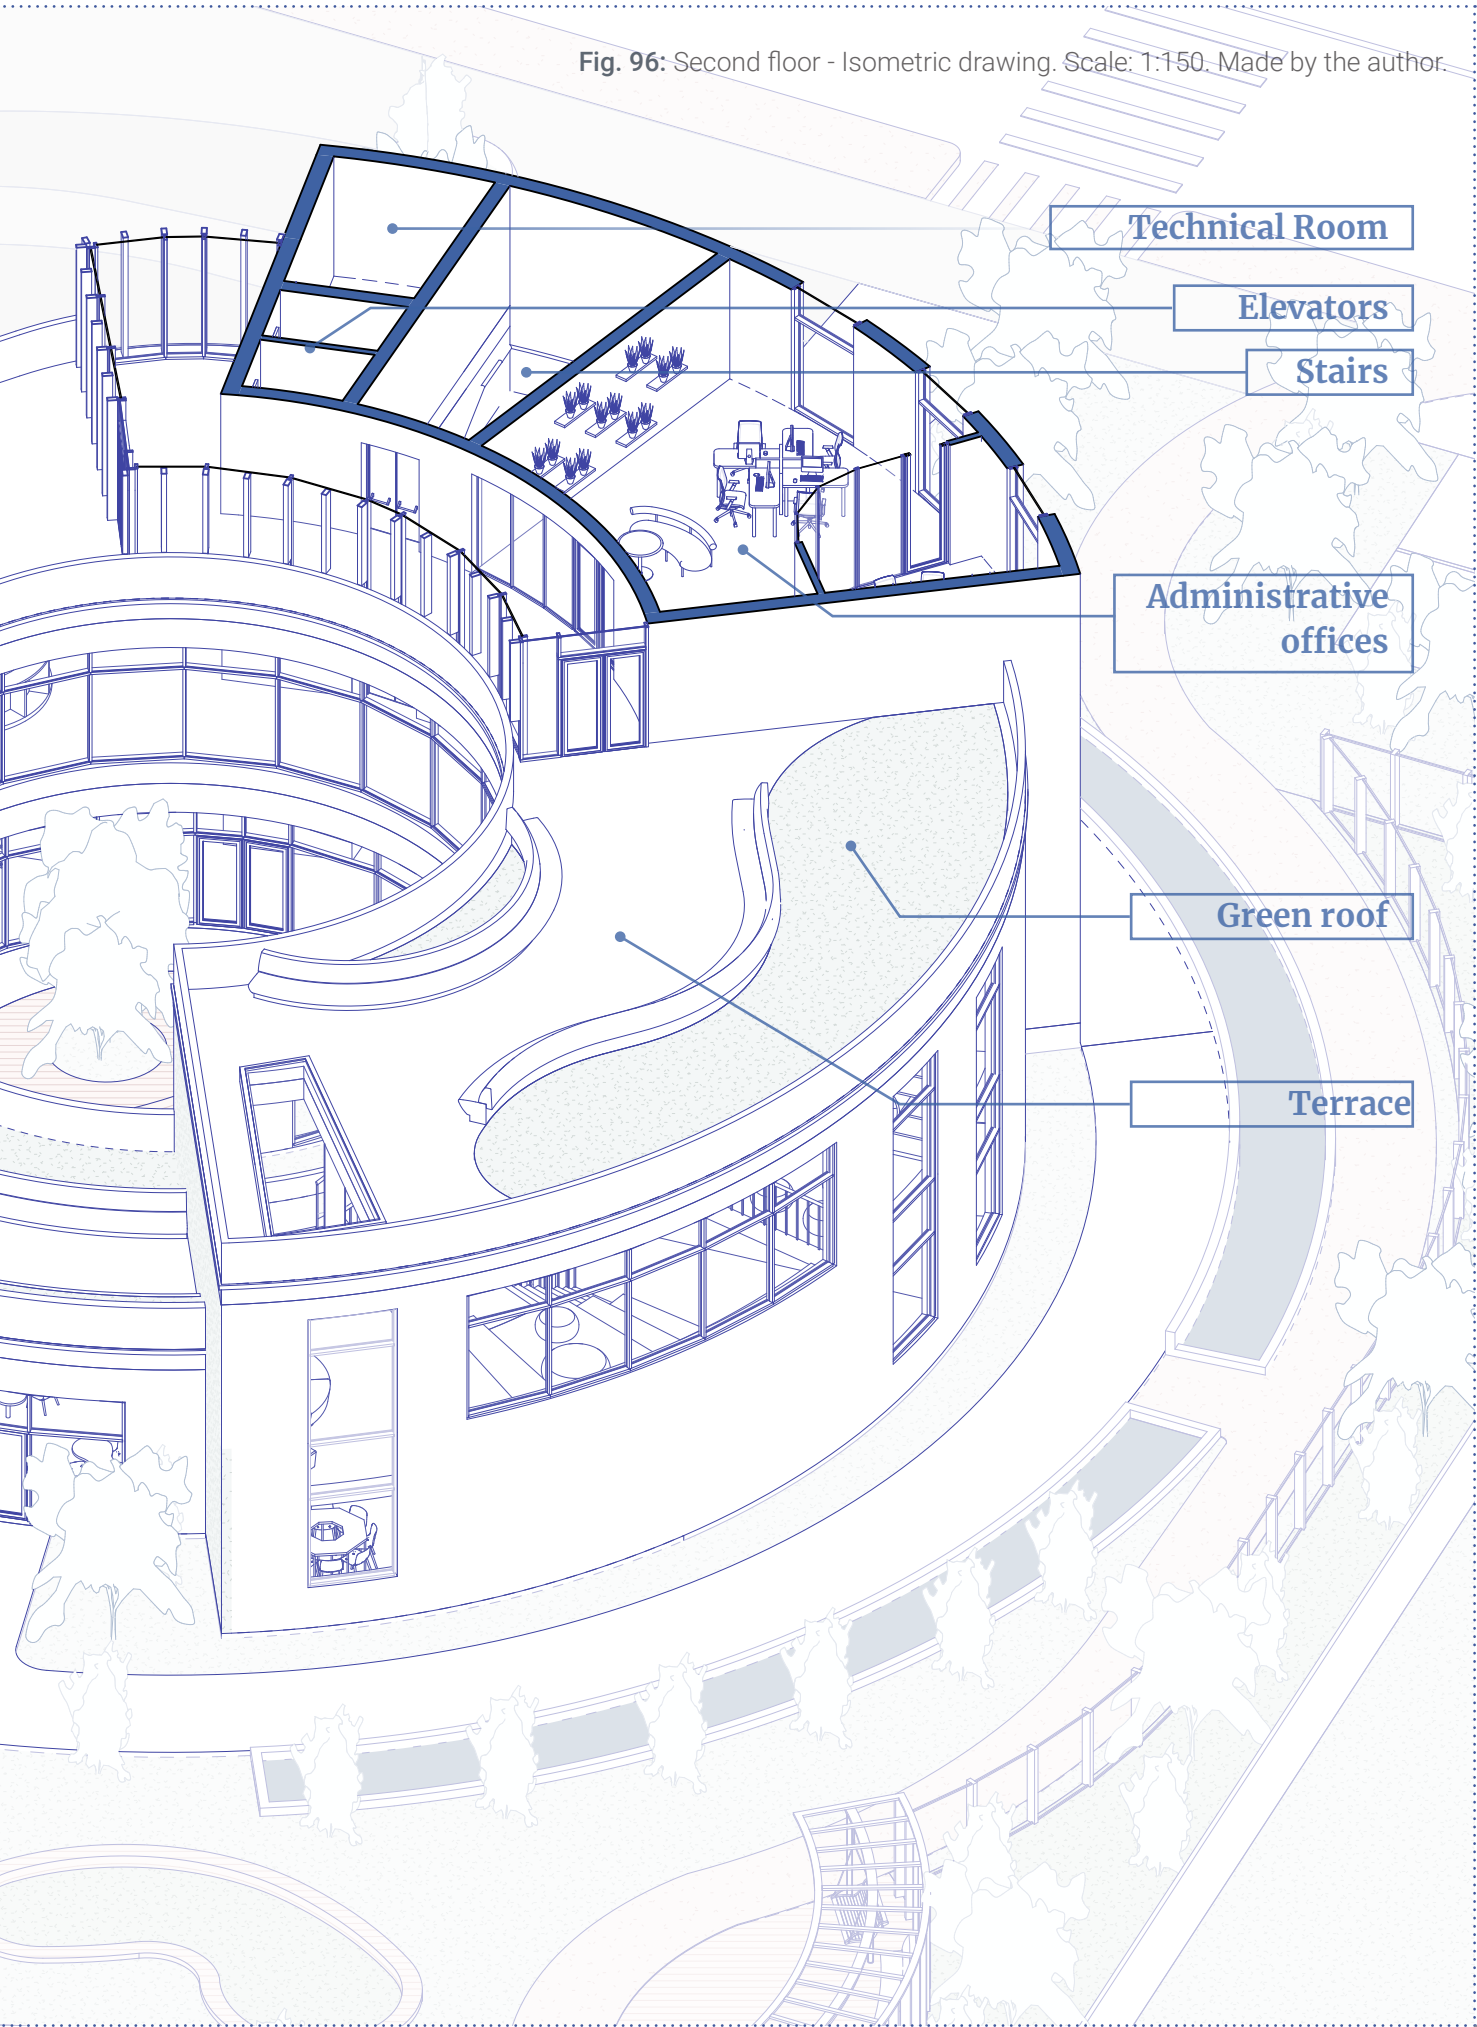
Second floor - Isometric drawing. Scale: 1:150. Made by the author.
